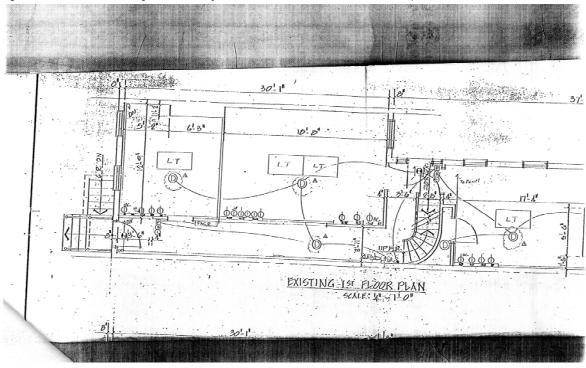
Permit drawings submitted by Princeton Electric, 5/19/1989; first floor plan.
